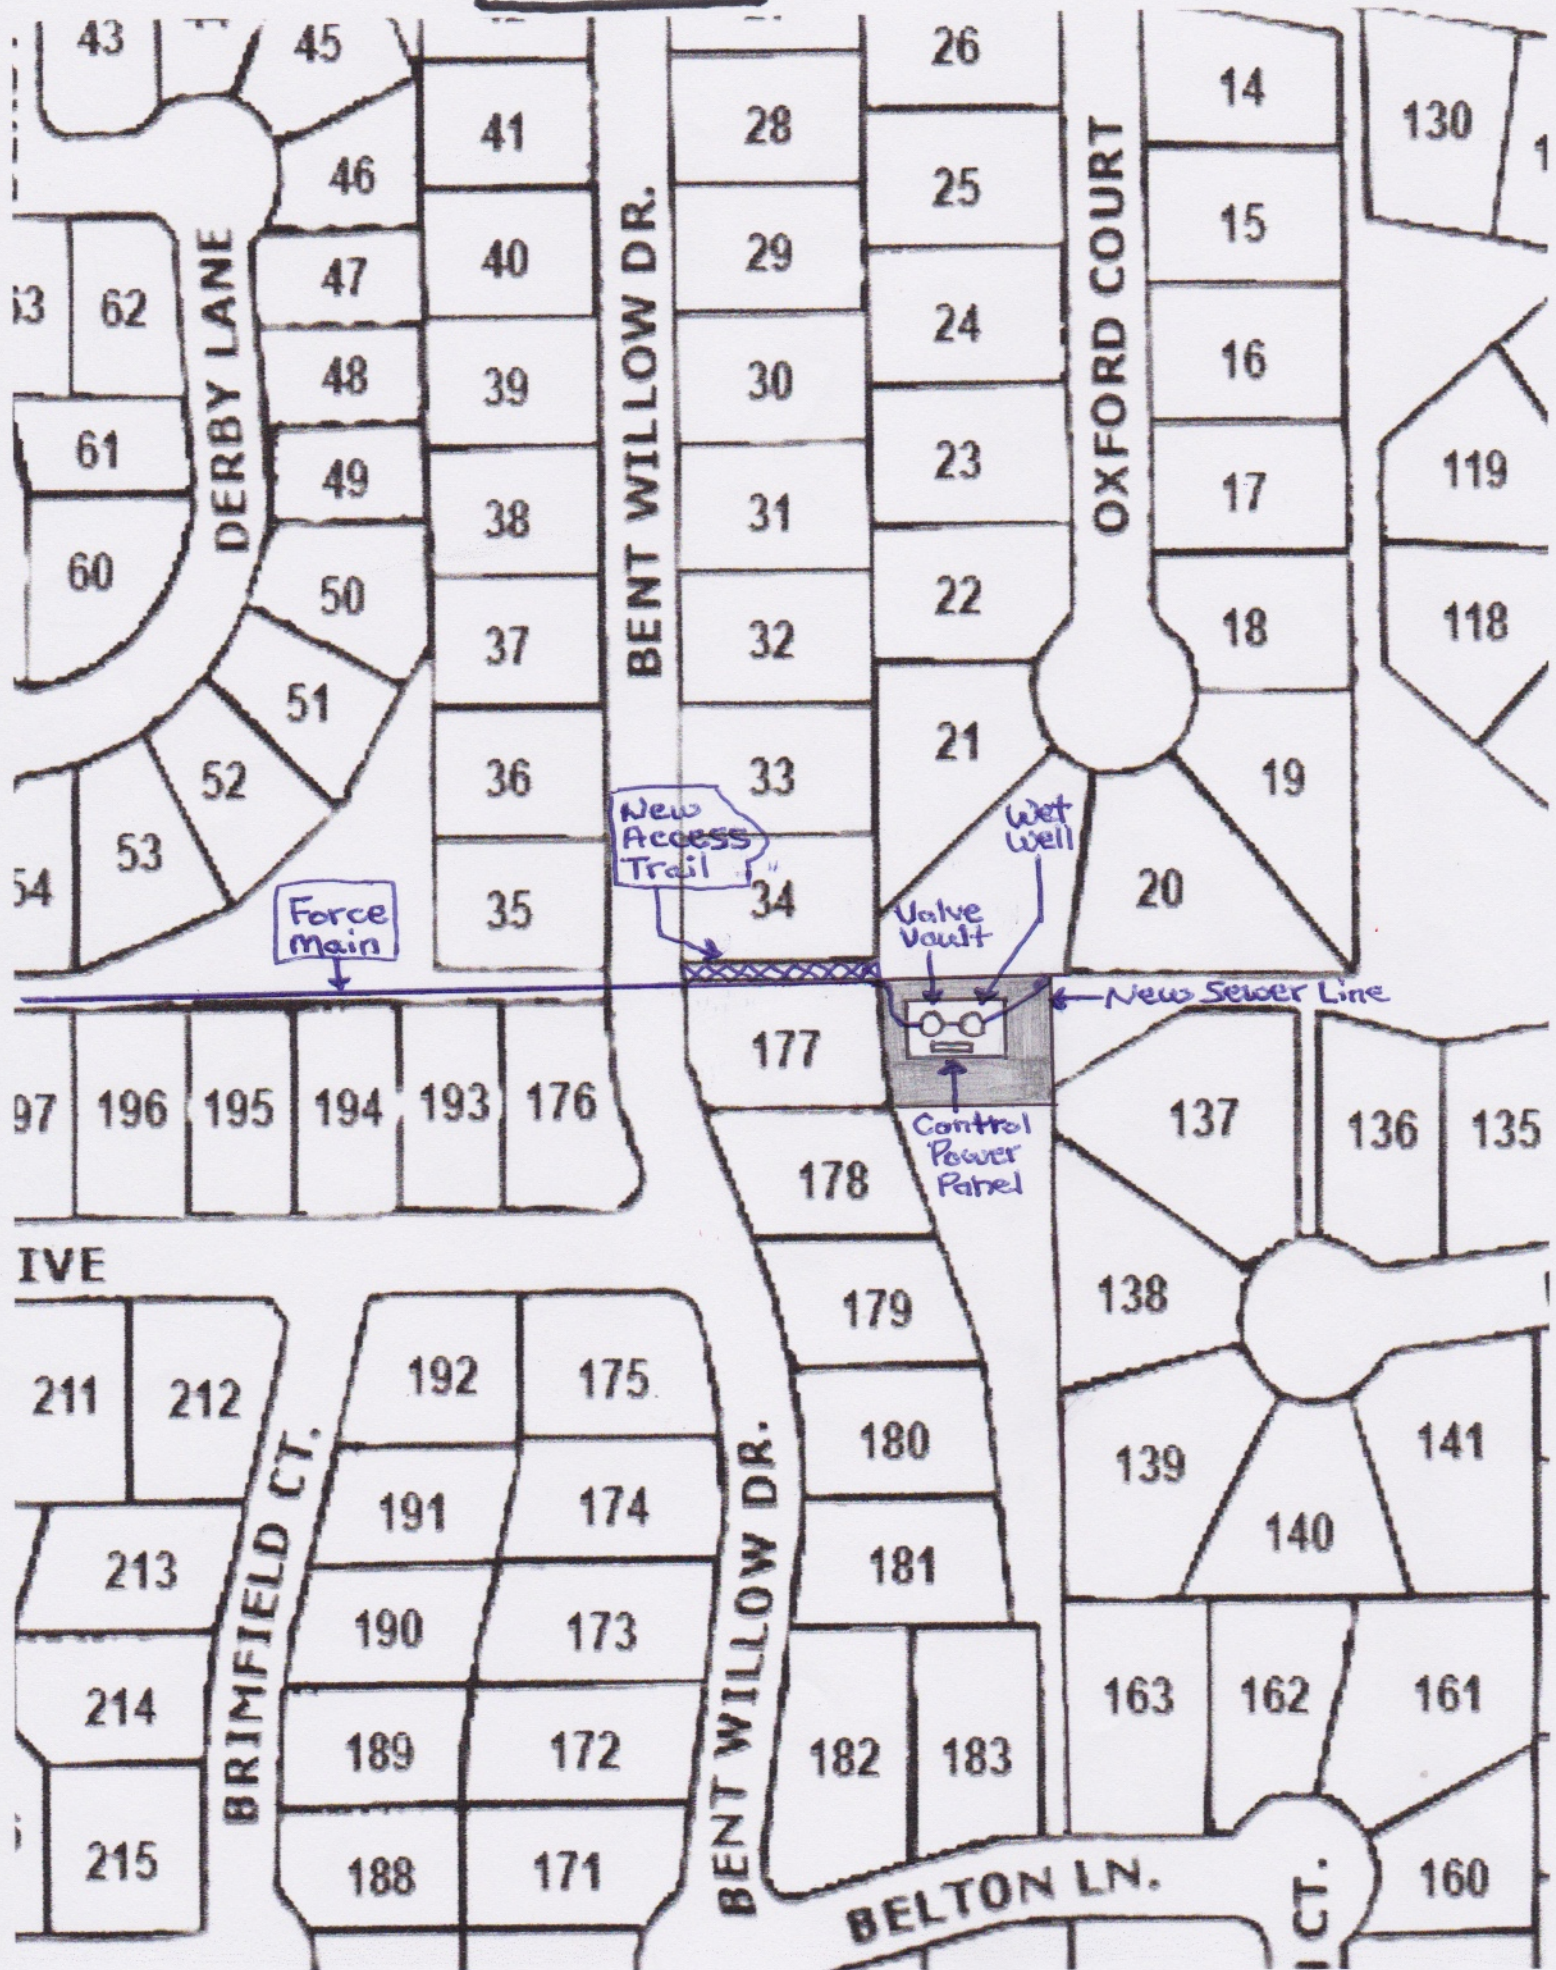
Figure B - Maintenance trucks will need routine access to this lift station facility, so City Utilities plans to install an access road coming off Bent Willow Drive and going between KDCA lot 34 and lot 177.
